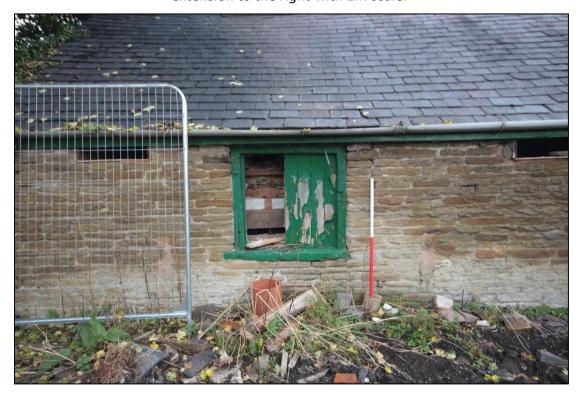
Boarded-up timber opening on the northern extent of western elevation.
